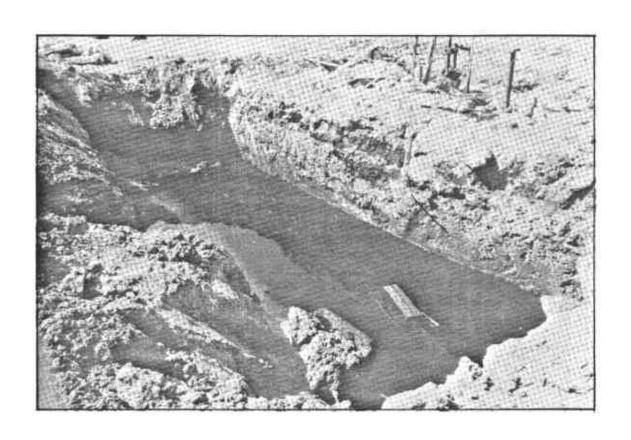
BAY CENTER FILL STRATA IN EXCAVATED TANK PIT 2, SE QUADRANT
